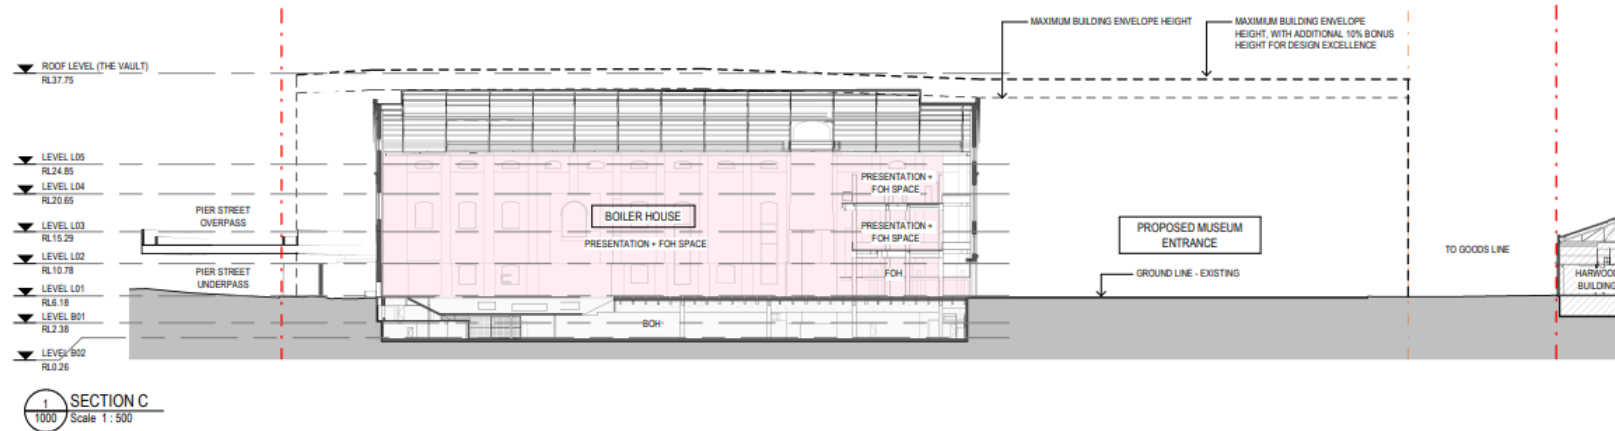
Ultimo Powerhouse- Powerhouse Sections 3 (Source: John Wardle Architects, 17 May 2022)
